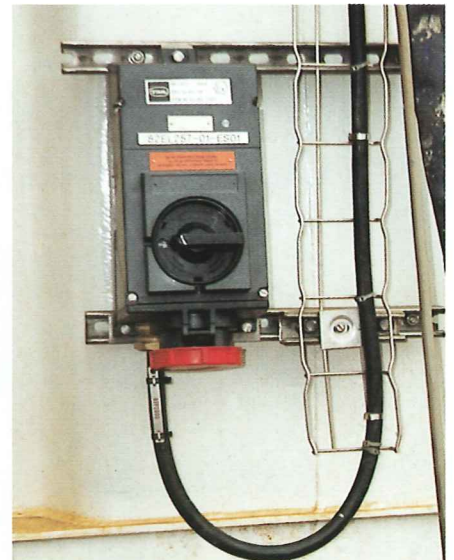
Explosion protected plug and socket system on the outside of the FPSO near the heliport
